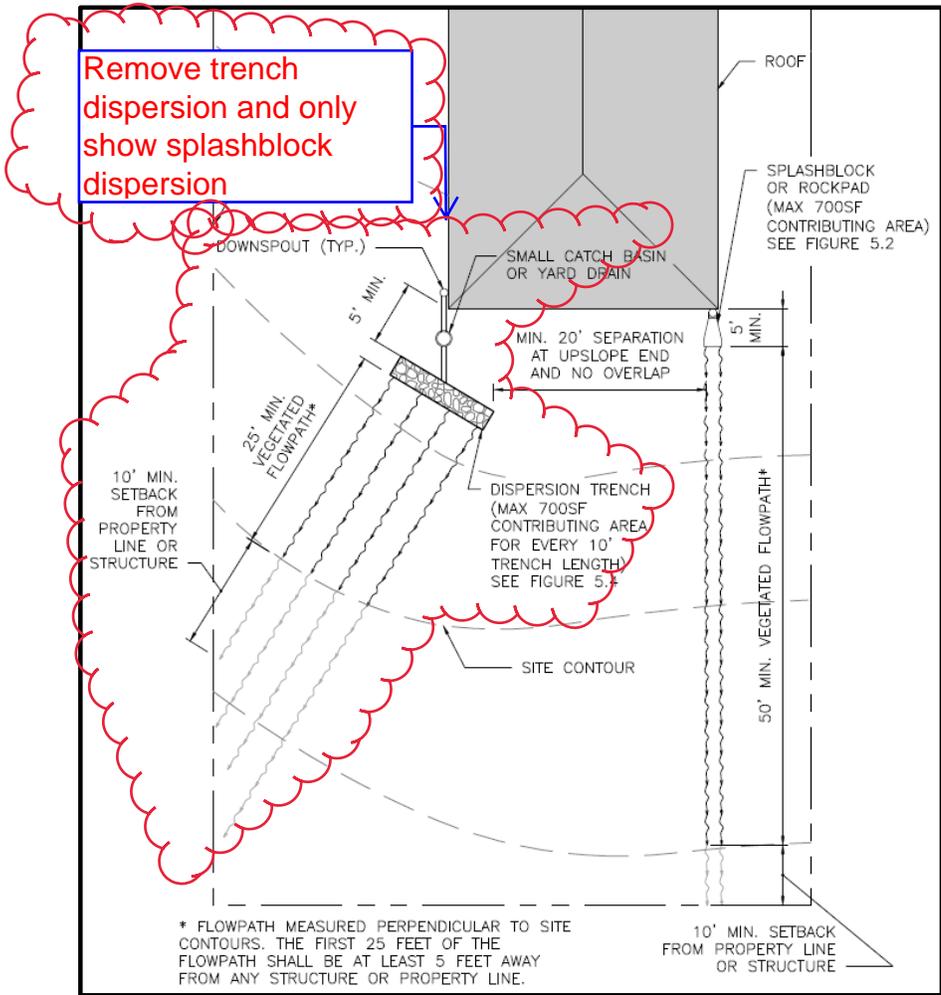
Typical Downspout Splashblock ~~and Dispersion Trench Plan.~~
